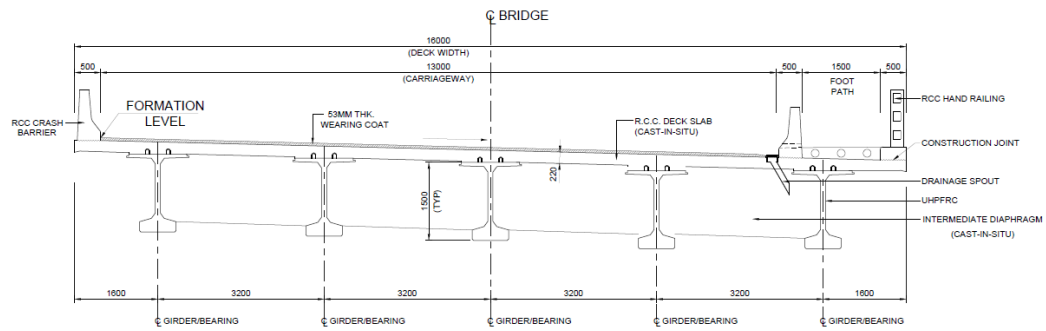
31 Cross section of 35m span UHPFRC post tensioned I girder at mid span
